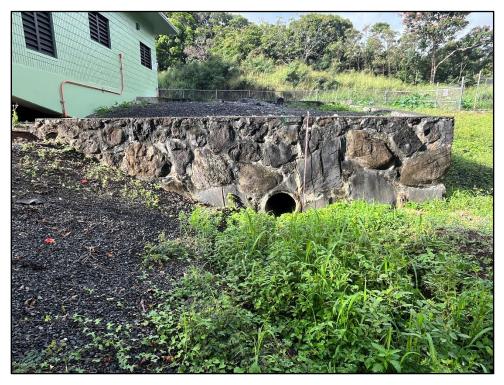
Photo R: View of northeast retaining wall at the Kukanono WWPS facility under evaluation for repair/replacement, view to southwest
